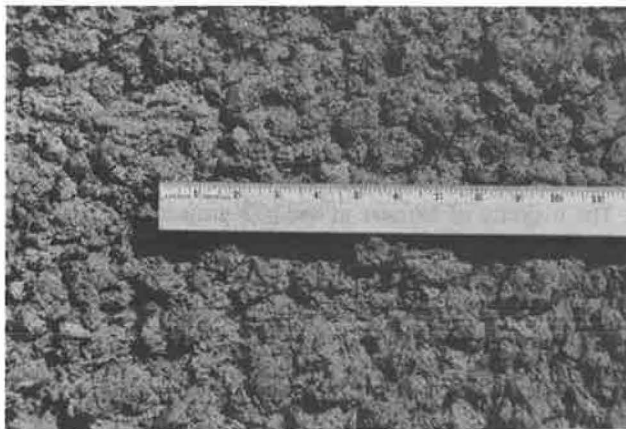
Fuzzy finish surface on nonhighway side of concrete barrier.
